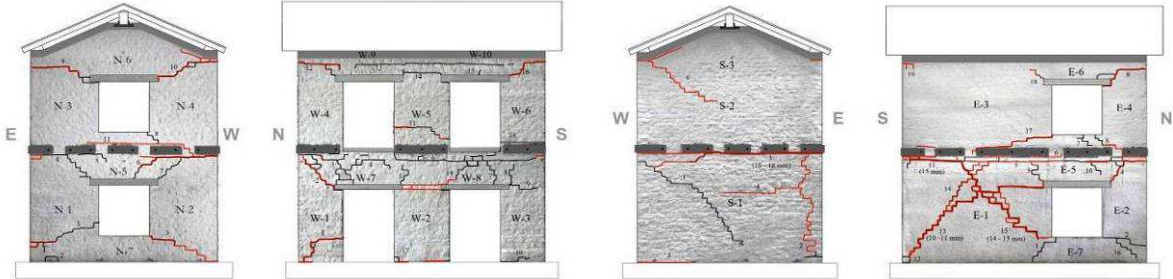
Crack pattern in the third building specimen after transportation to the shaking table. From left: North, West, South and East façade.
